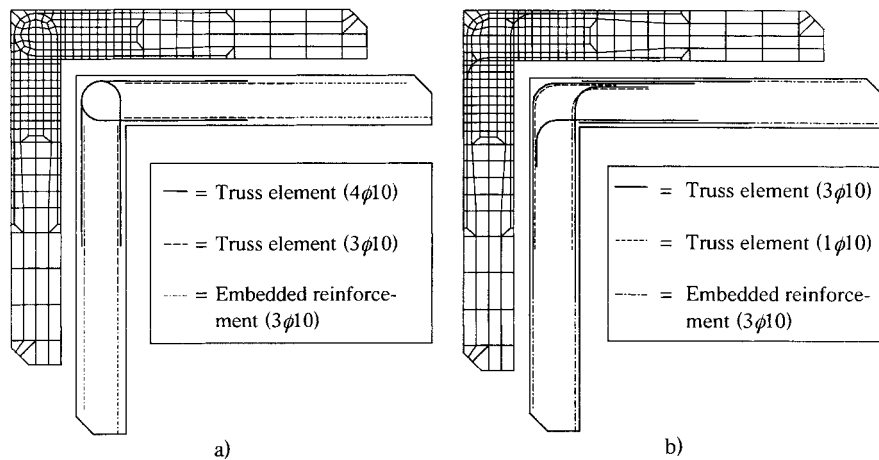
FE Mesh and Modeling of Reinforcement Bars of Frame Corner with: (a) New Reinforcement Detailing; (b) Conventional Detailing
